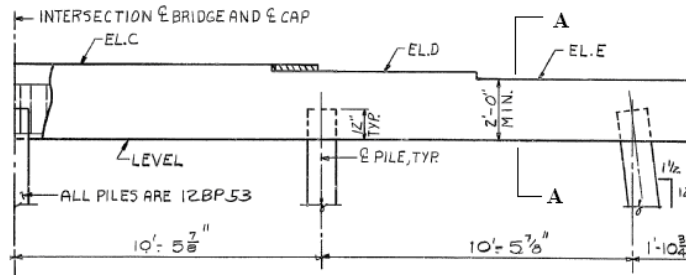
Pier Cap Elevation (Ref. GDOT Drawings)
